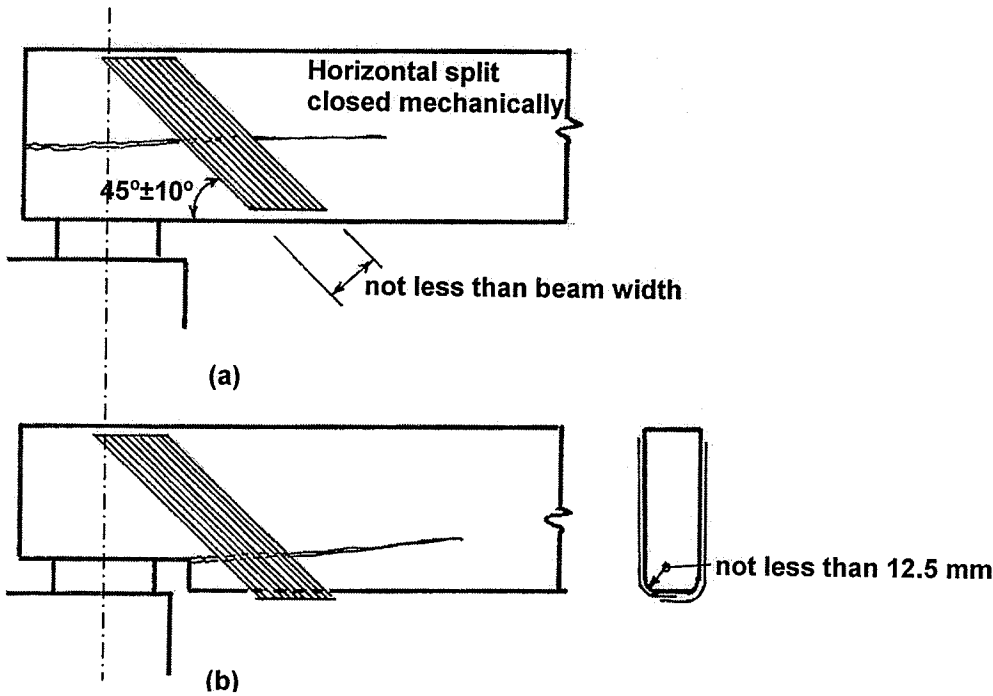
Elevation of timber beam with GFRP sheets for shear strengthening
